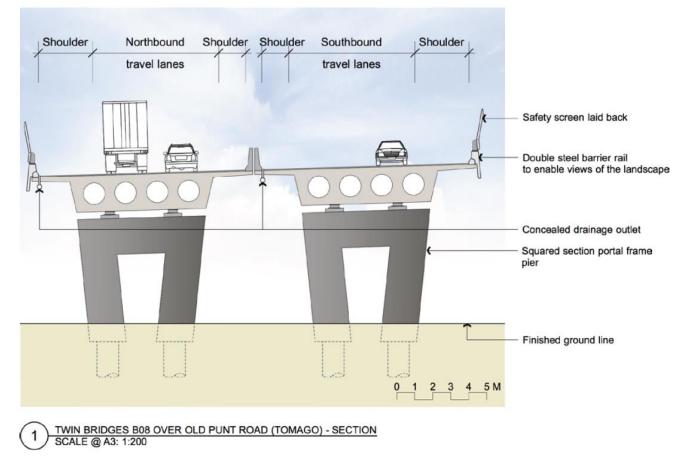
Indicative drawing of the voided slab bridge structure (B08)
